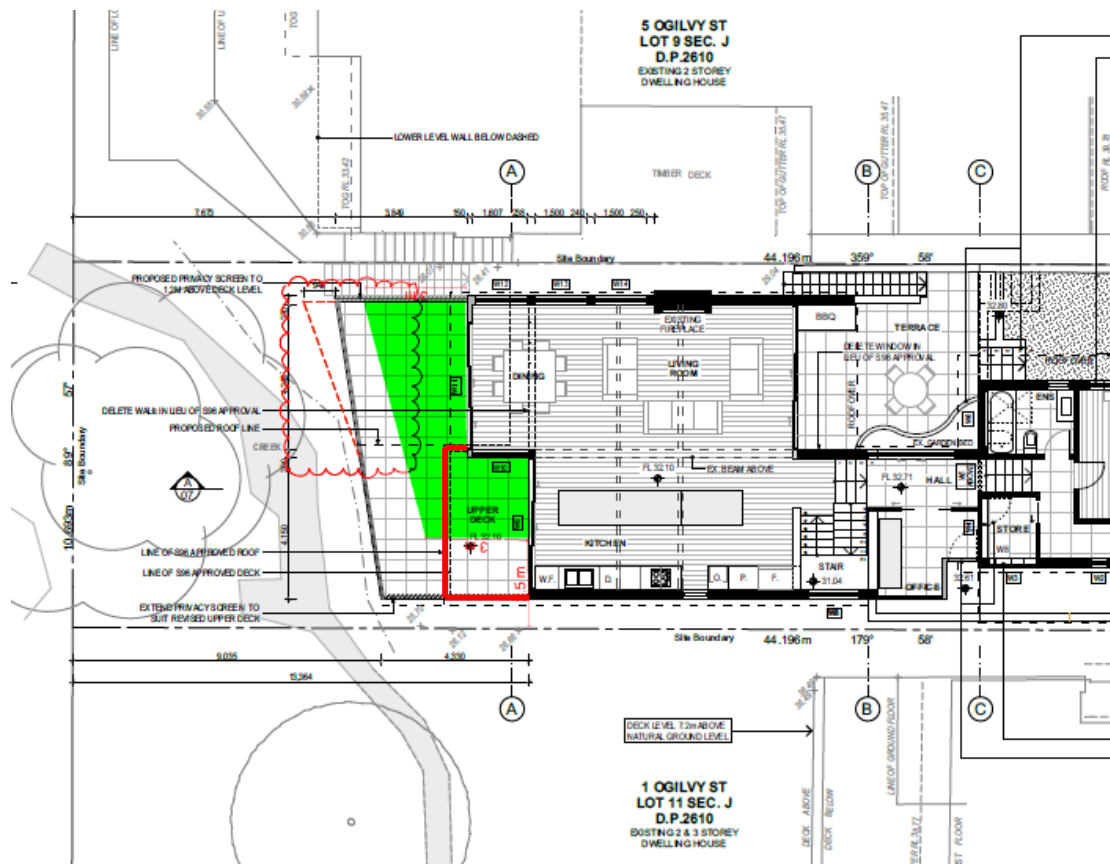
Plan showing previously approved deck alignment in red, the proposed deck extension and conditioned deck extension/ geometry in green.
